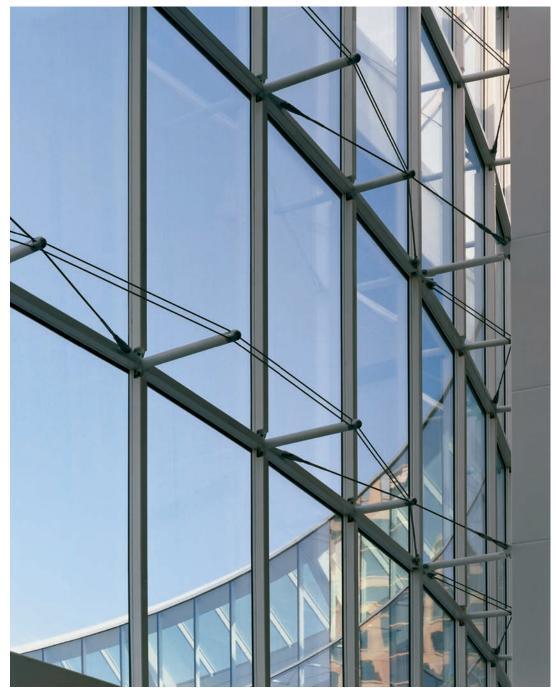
Detail of horizontal cable trusses in a curved facade.
